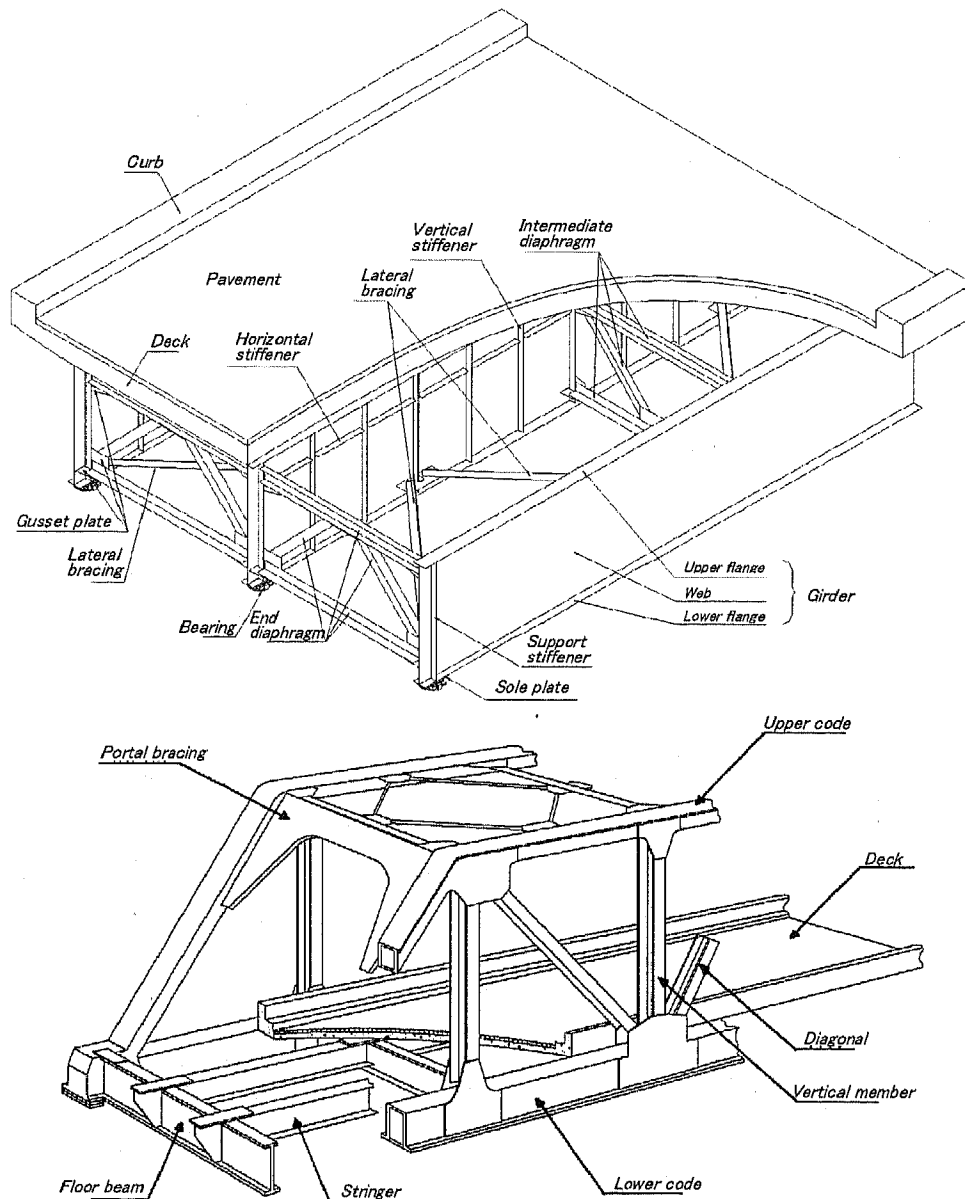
Typical members of steel bridge (above: steel girder bridge, below: truss bridge)
